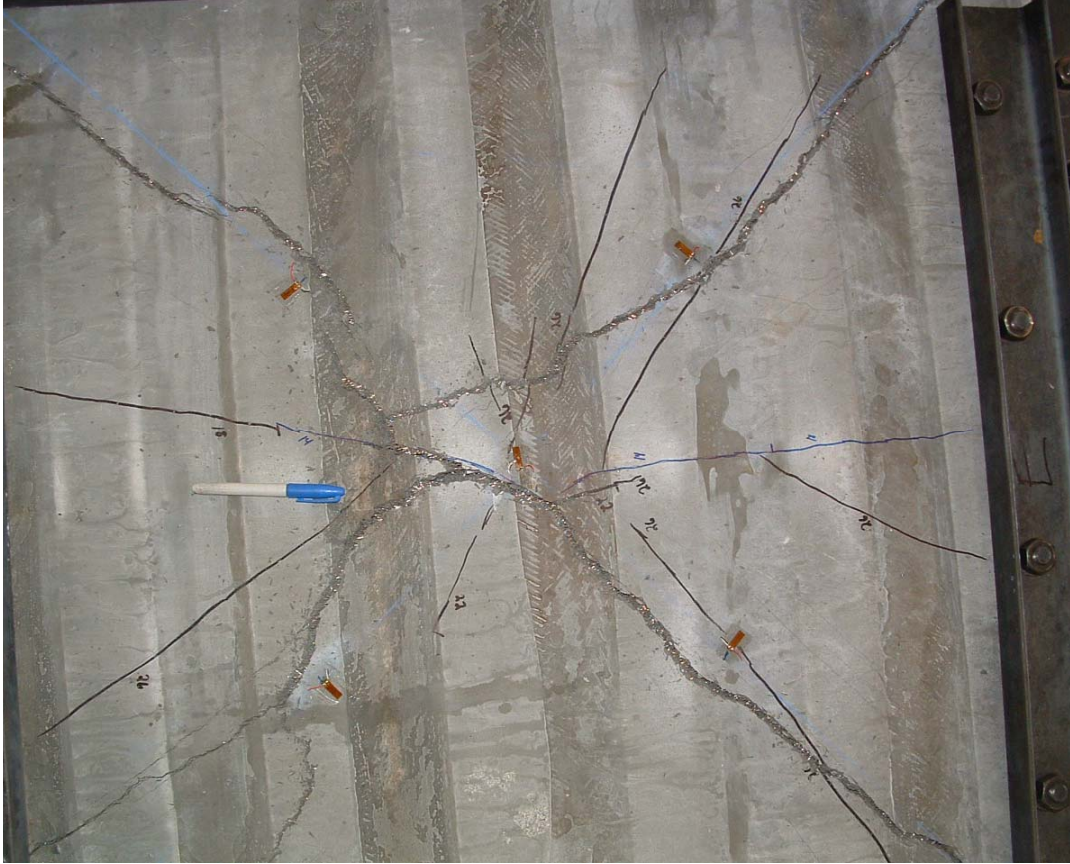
Failure Surface (3.0 in. slab – 1.75 in. plate)
